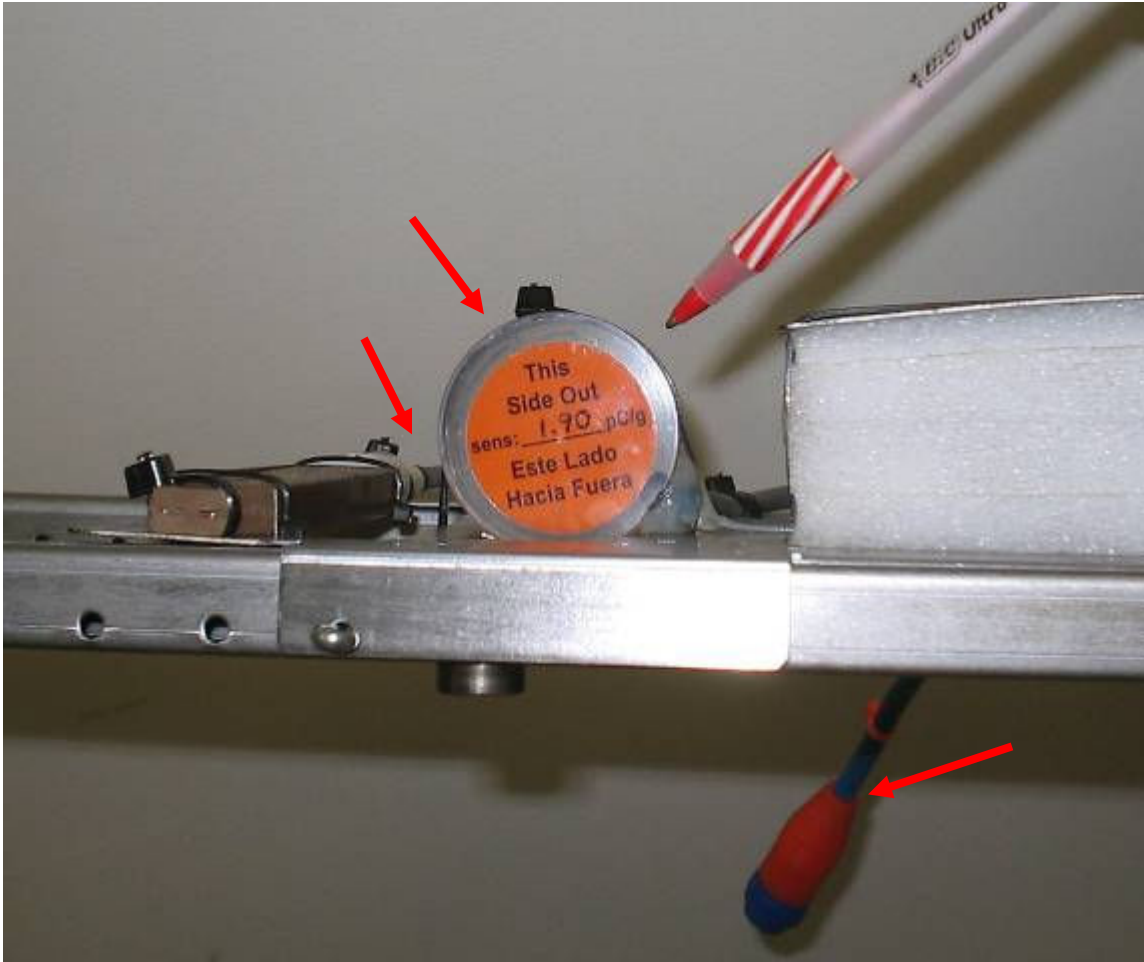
note gauge pack in pile cage with nylon ties installed, and locating tape band visibly aligned with the two dot hole markers in the diverter shield. The dot markers are mechanically in-line with the center of the accelerometer and strain gauge active area.
